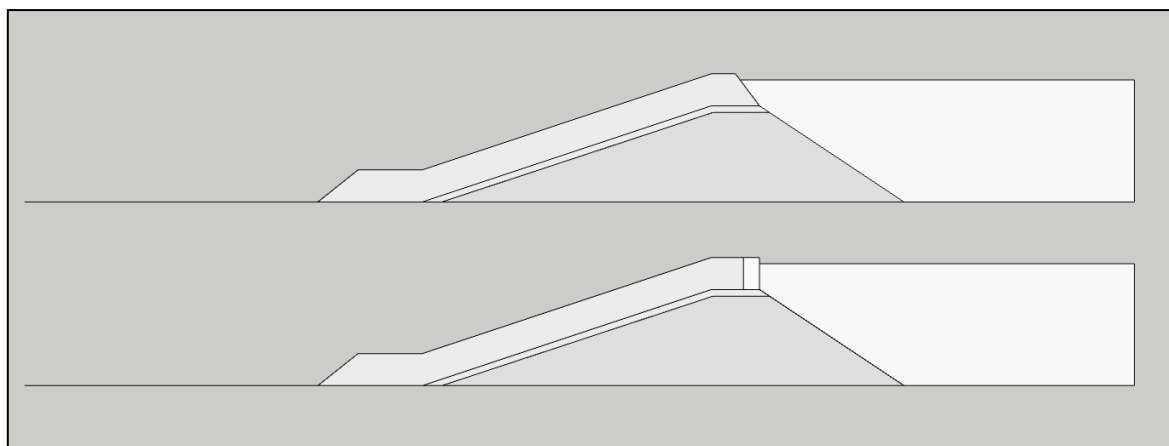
Embankment Arrangement for LLRN; a concrete crest wall may be raised to further limit overtopping discharge across the cope-line
